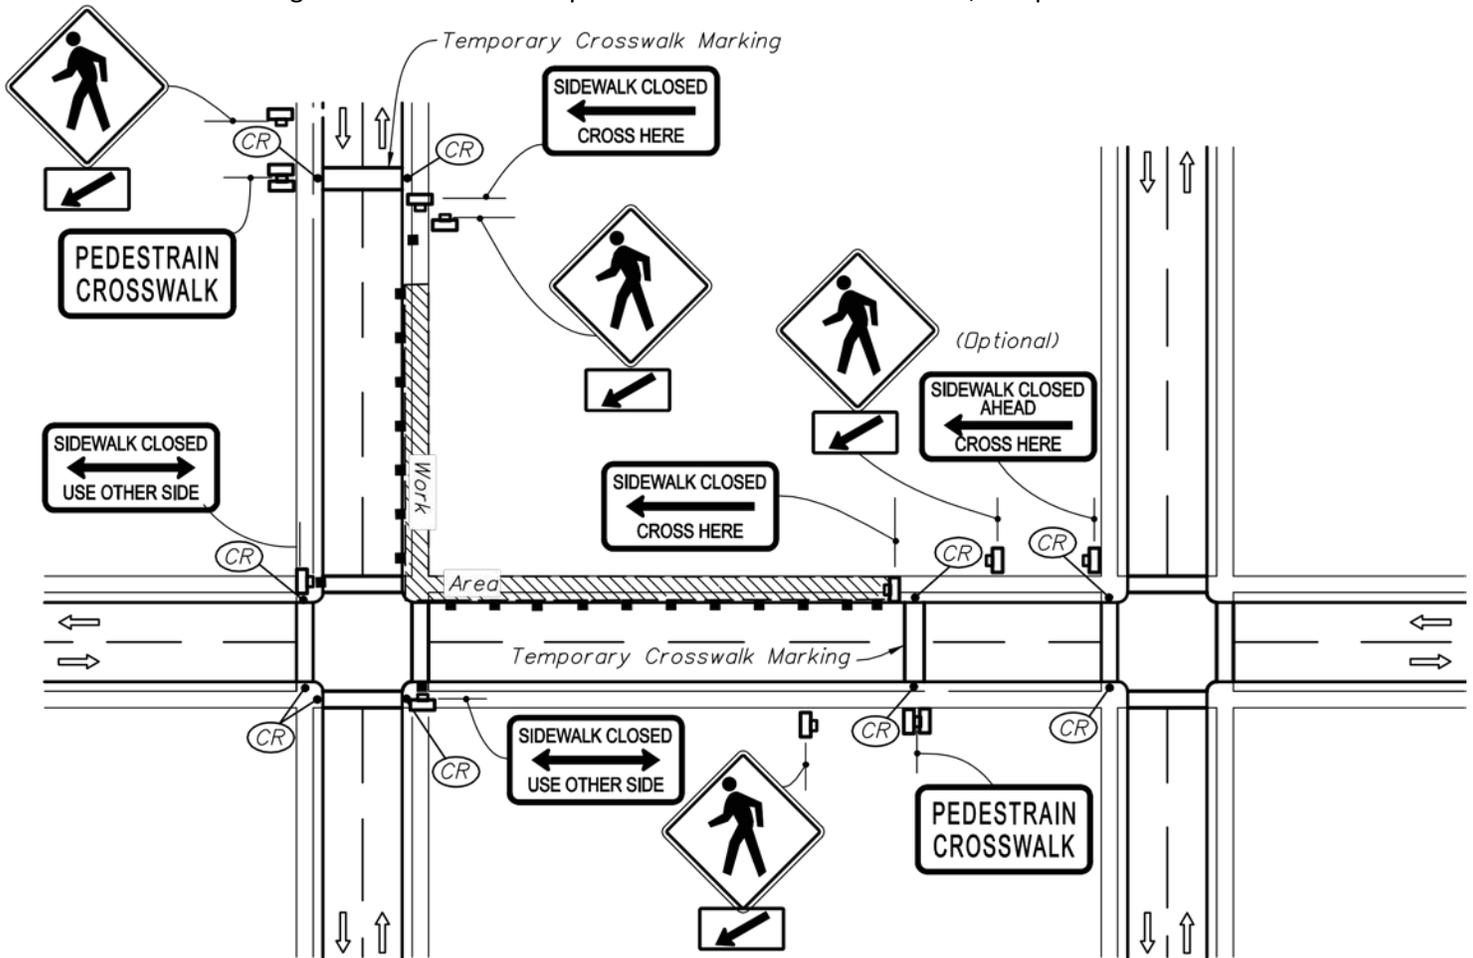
Corner Sidewalk Closure with Temporary Crosswalks
